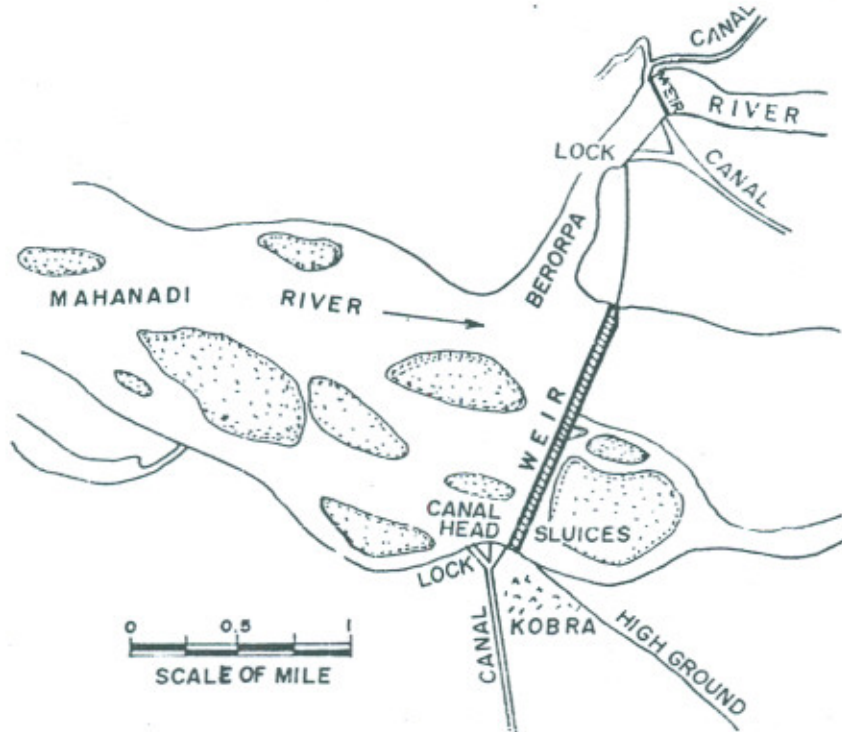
(a) - SITE PLAN OF JOBRA WEIR AT MAHANADI RIVER
